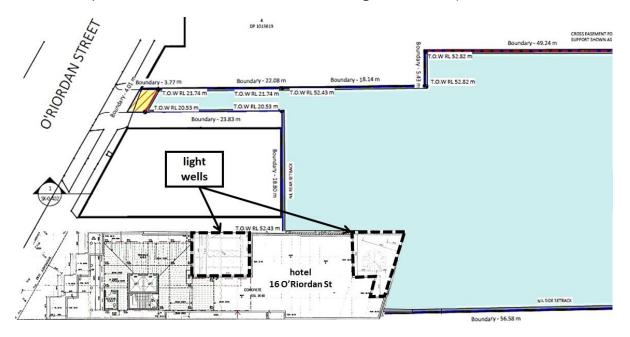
Envelope plan relative to adjacent hotel light-wells at 16 O'Riordan Street.
